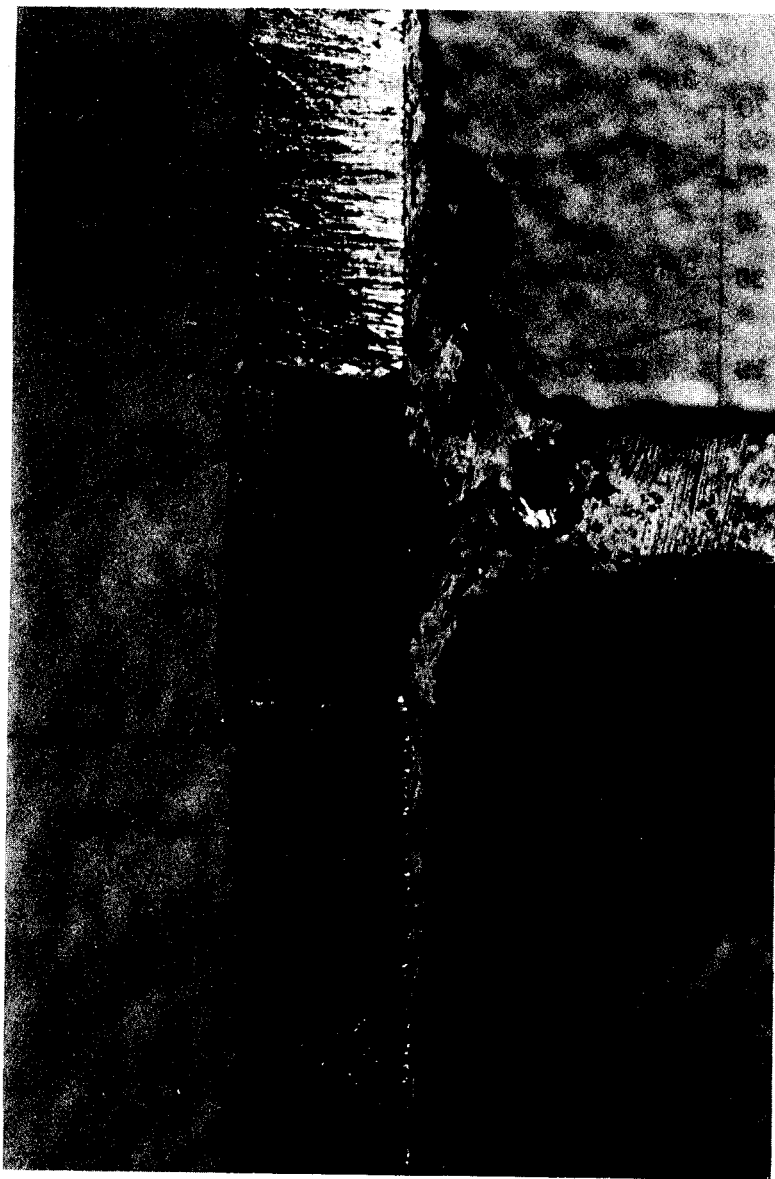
FATIGUE CRACK IN BEAM WEB AT TOE OF GUSSET
